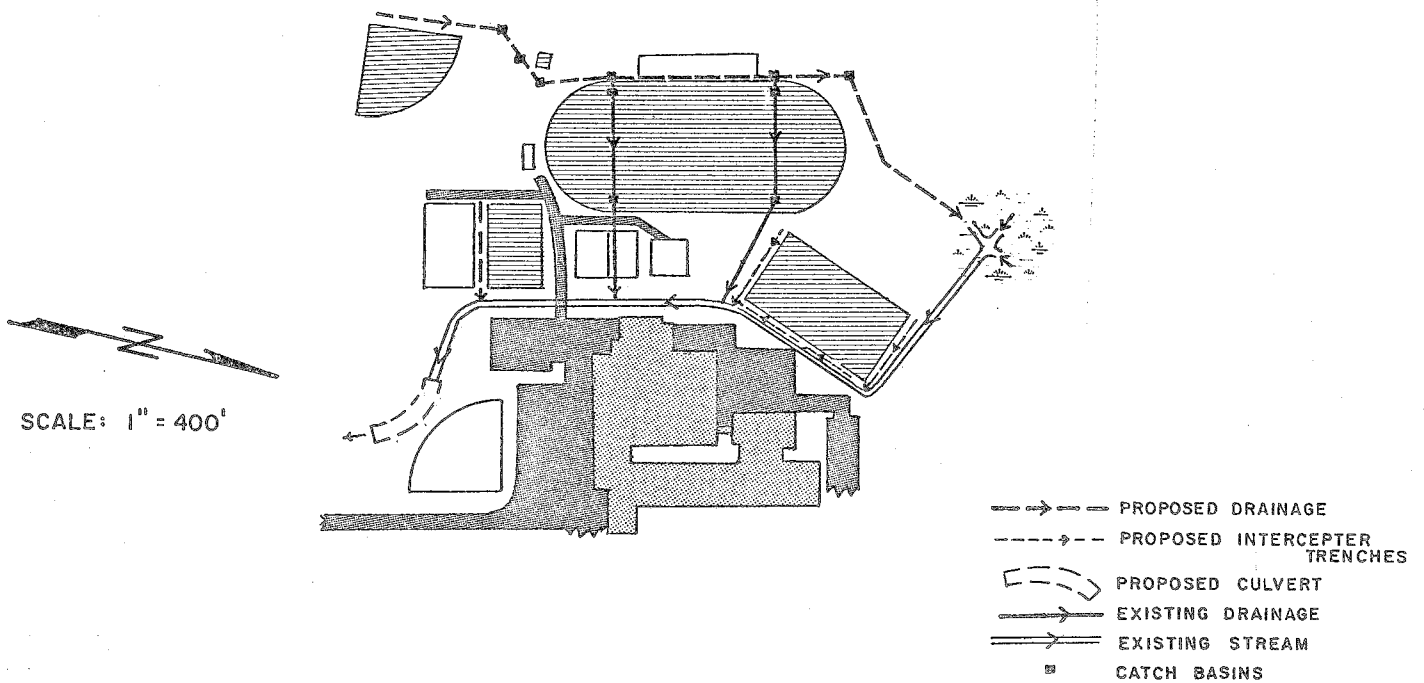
SIMPLIFIED SITE PLAN\
